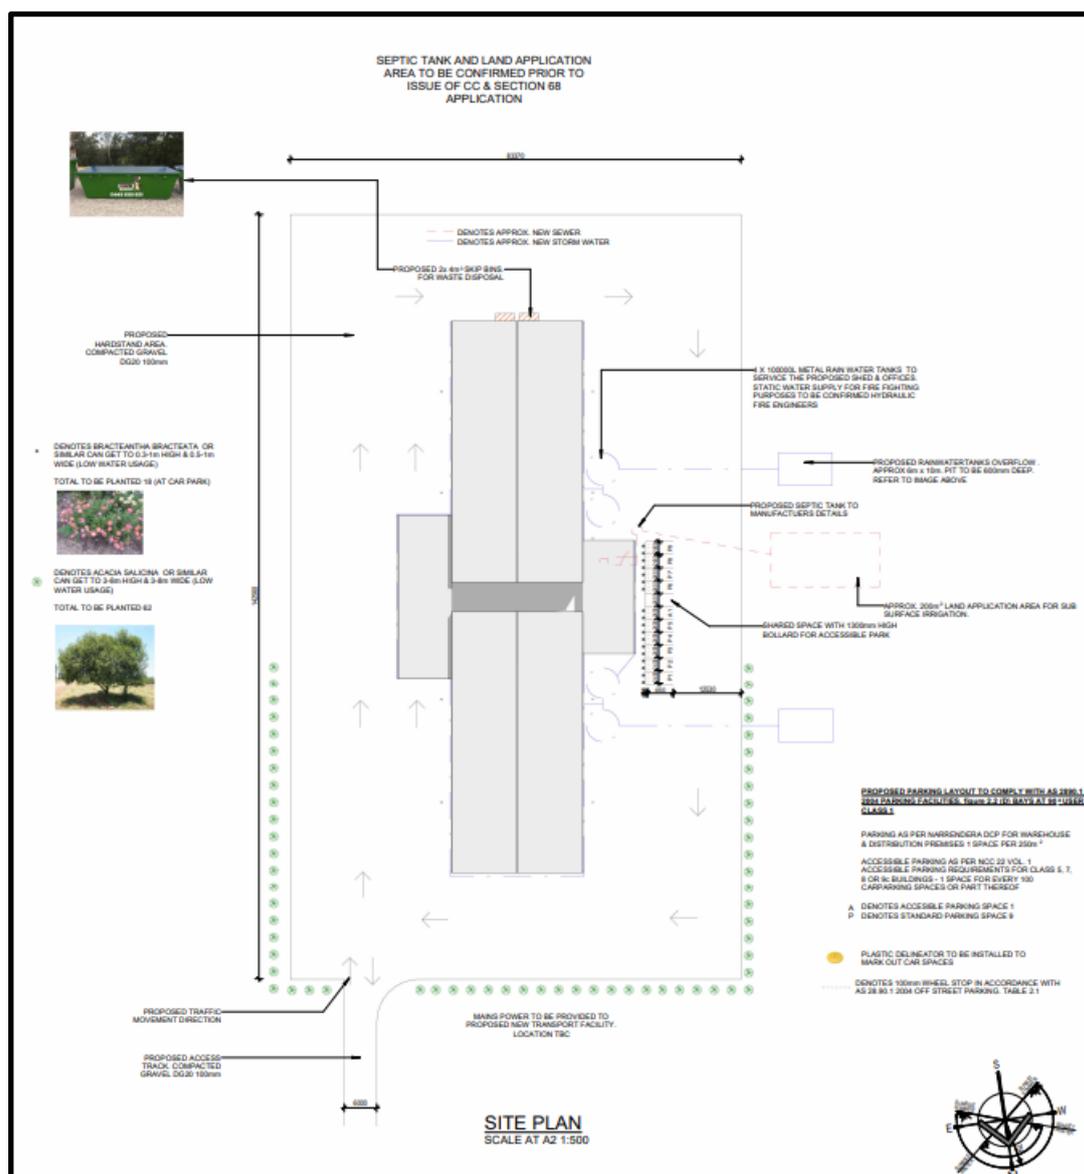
Proposed Partial Site Plan (Source: Reward Character Designs)
